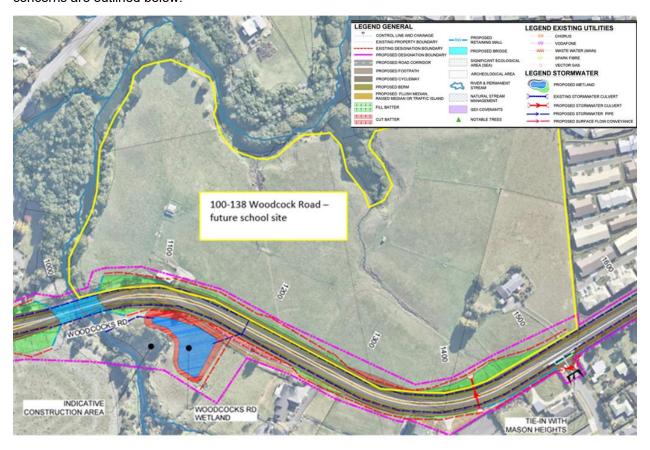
Proposed works in proximity to the Ministry's site at 100-138 Woodcocks Road (Future school site is outlined in yellow)
